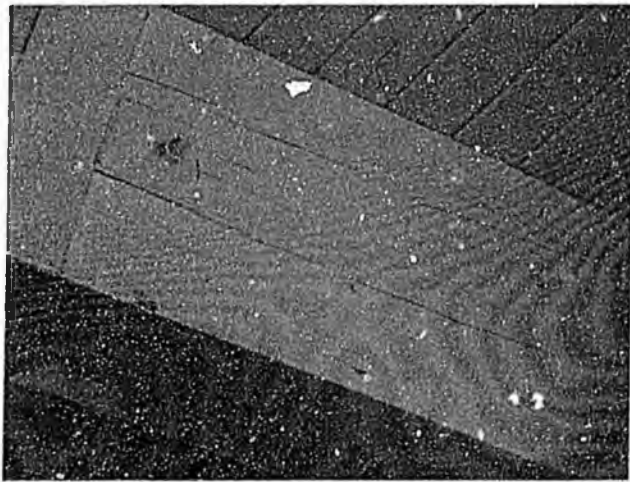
View showing cracks in glulam at cantilever that may be overstressed.
